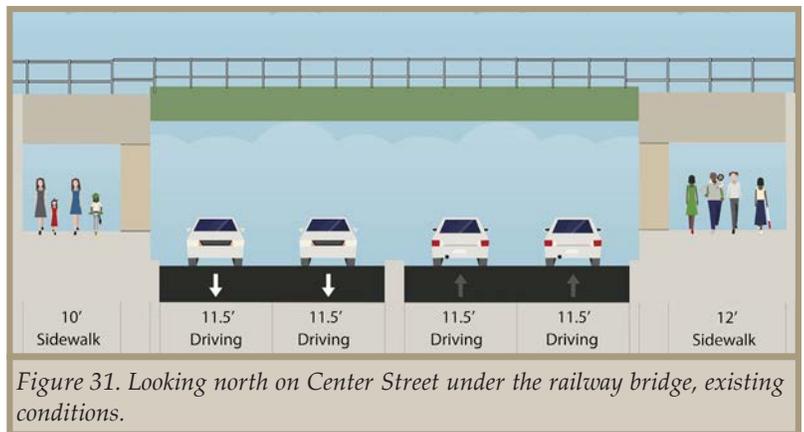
Looking north on Center Street under the railway bridge, existing conditions.
